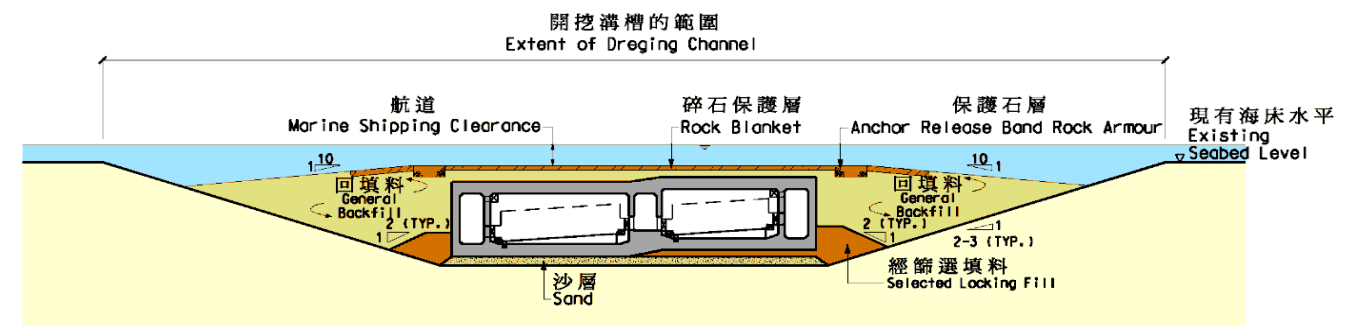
Typical Section through Immersed Tube Tunnel (IMT)
